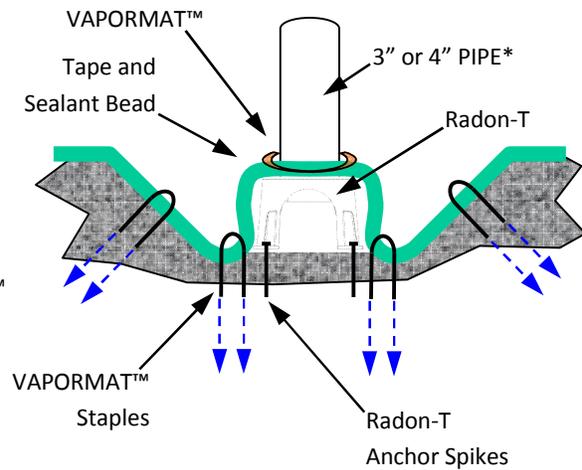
DETAIL: CONNECTING VAPORMAT™ TO RADON-T
